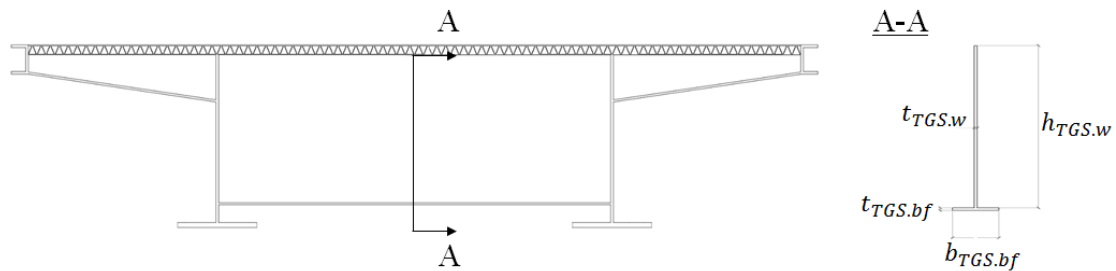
Dimensions of transverse support girders in SSD bridge.
